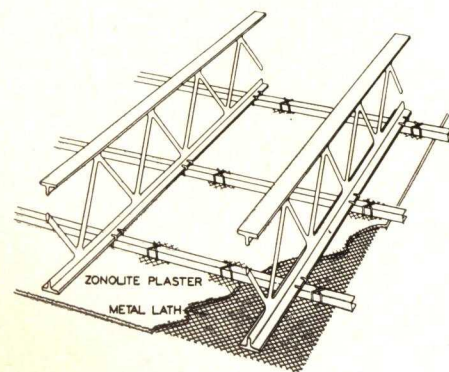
Furred ceiling Zonolite Plaster on Metal Lath.
